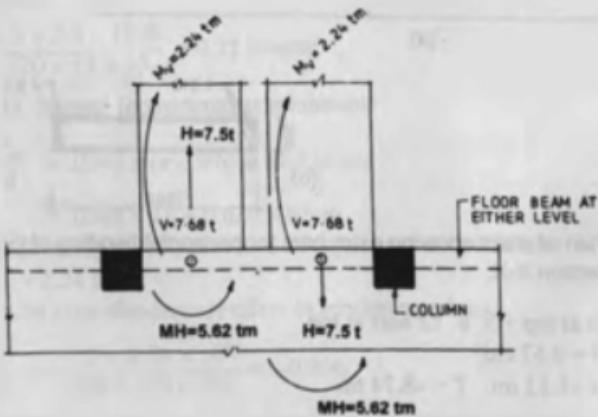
Reactions due to stairs on the supporting beams at either level.
